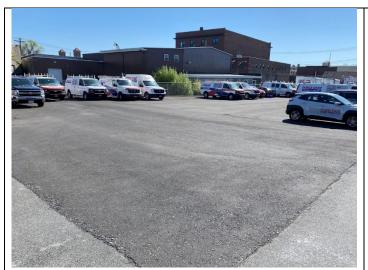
Overview of newly paved area within Site boundaries, looking northeast.
